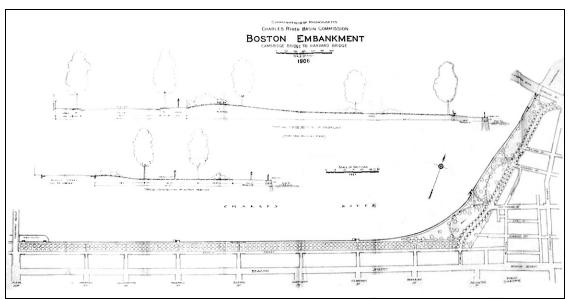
Schematic 1906 plan of Back Bay section of the Esplanade. (DCR archives)
